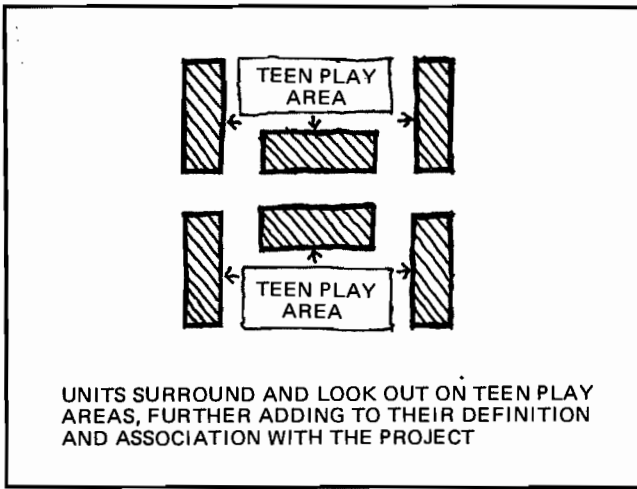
Teen Play Areas Surrounded by Buildings and Their Entries
